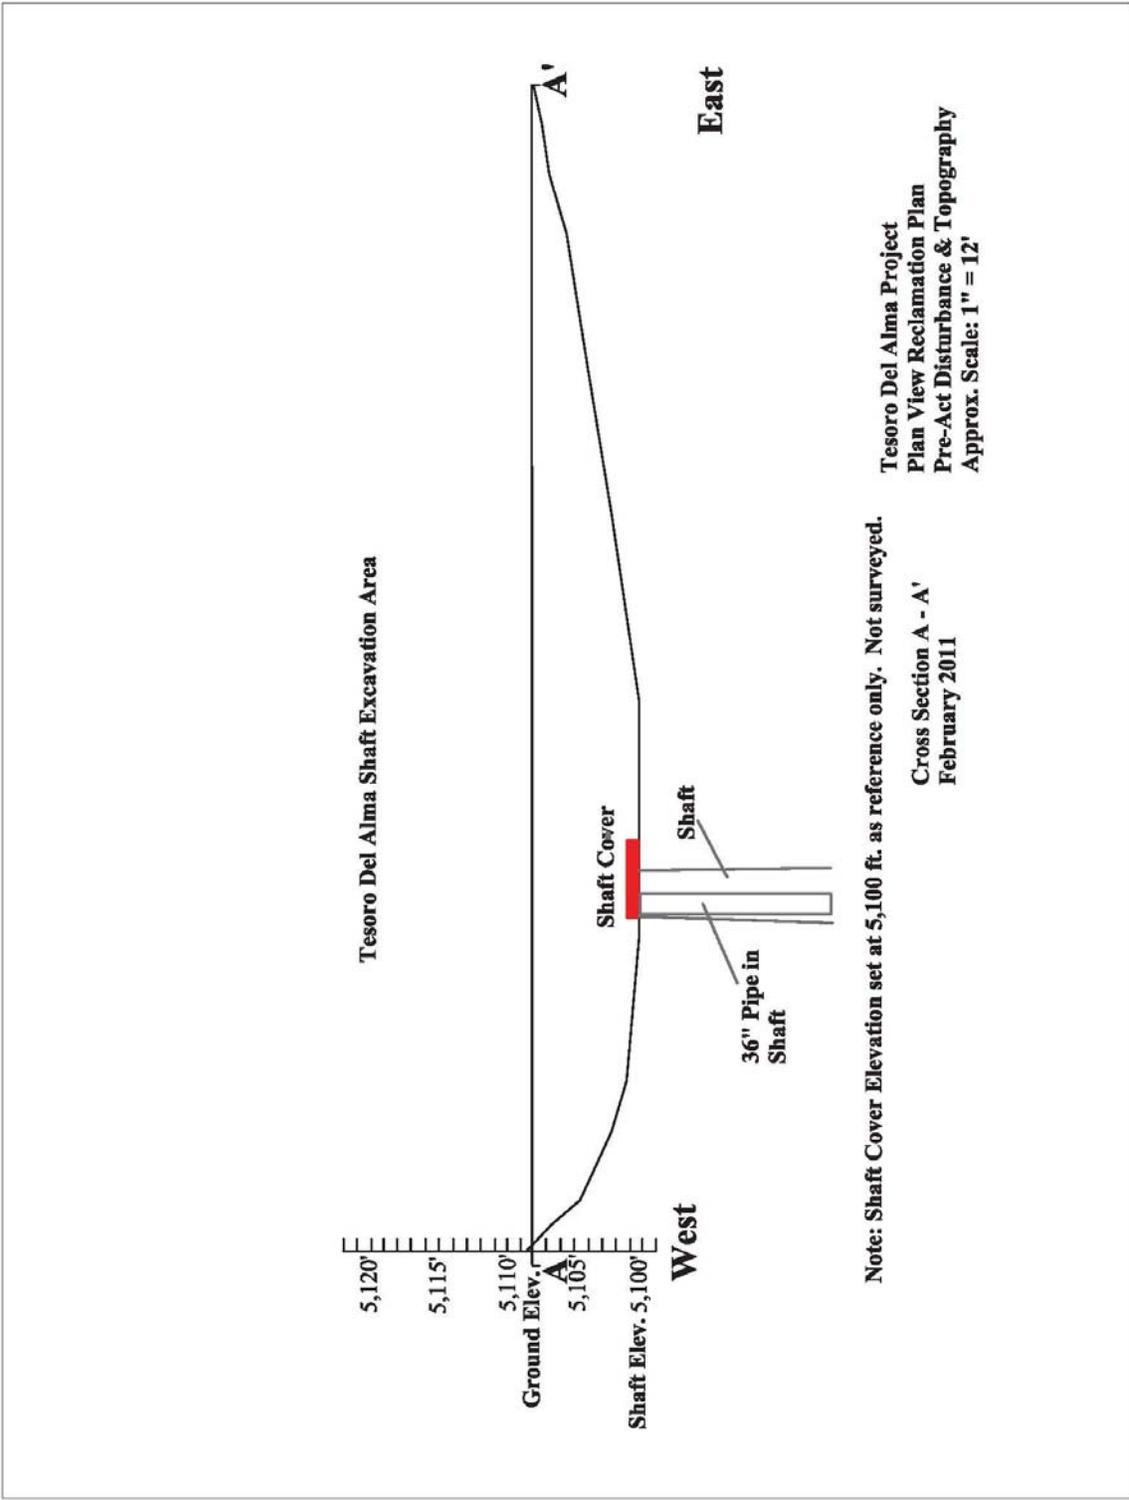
Appendix A. Shaft Excavation Area in Cross Section.
